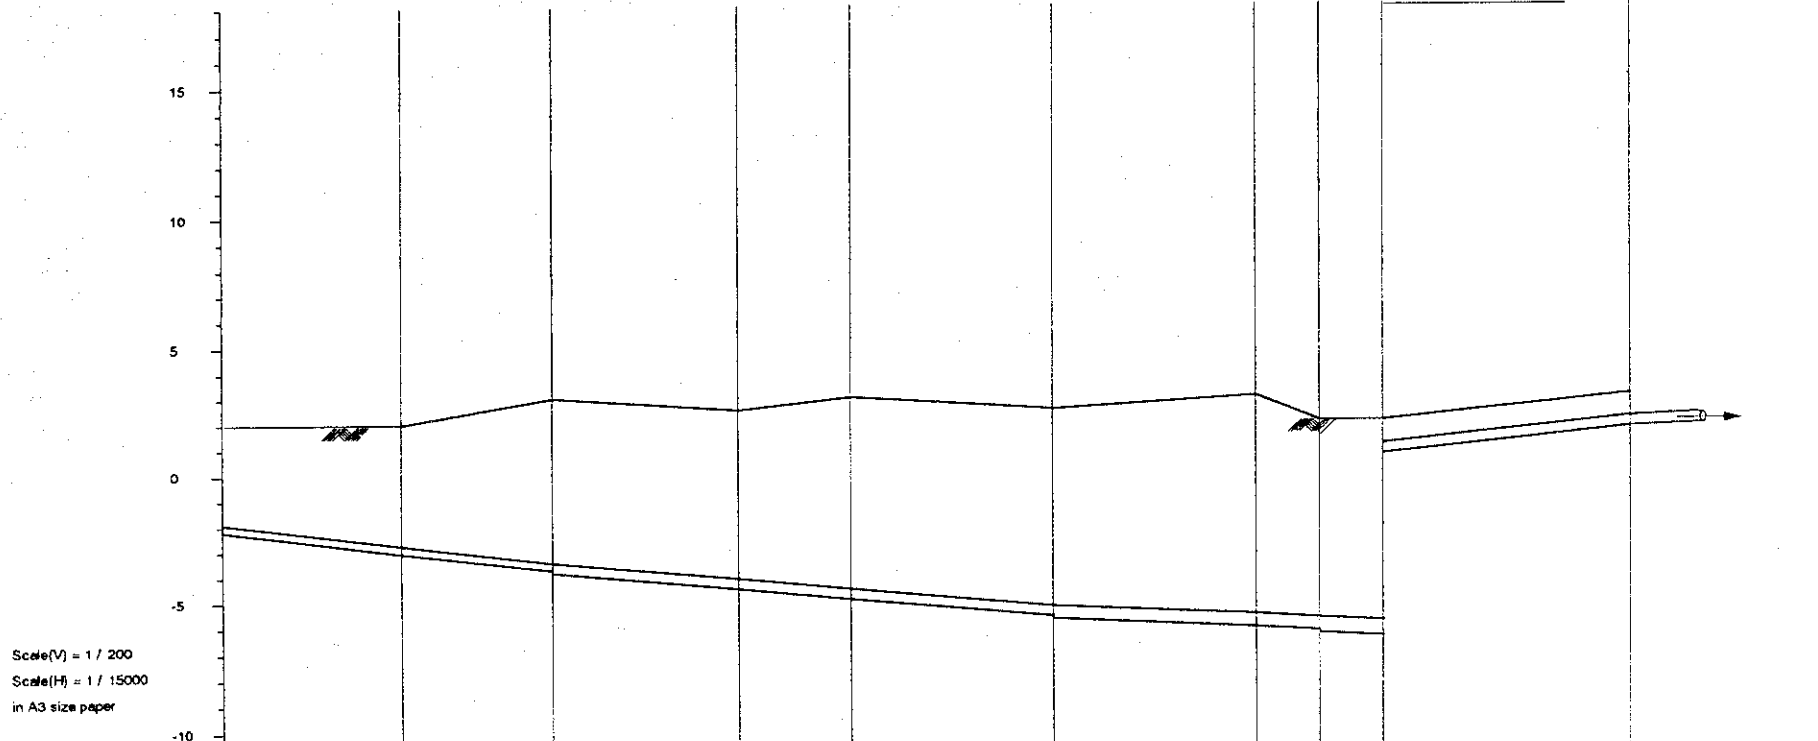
Longitudinal Profile of Proposed Sewer to Janga 5-2
